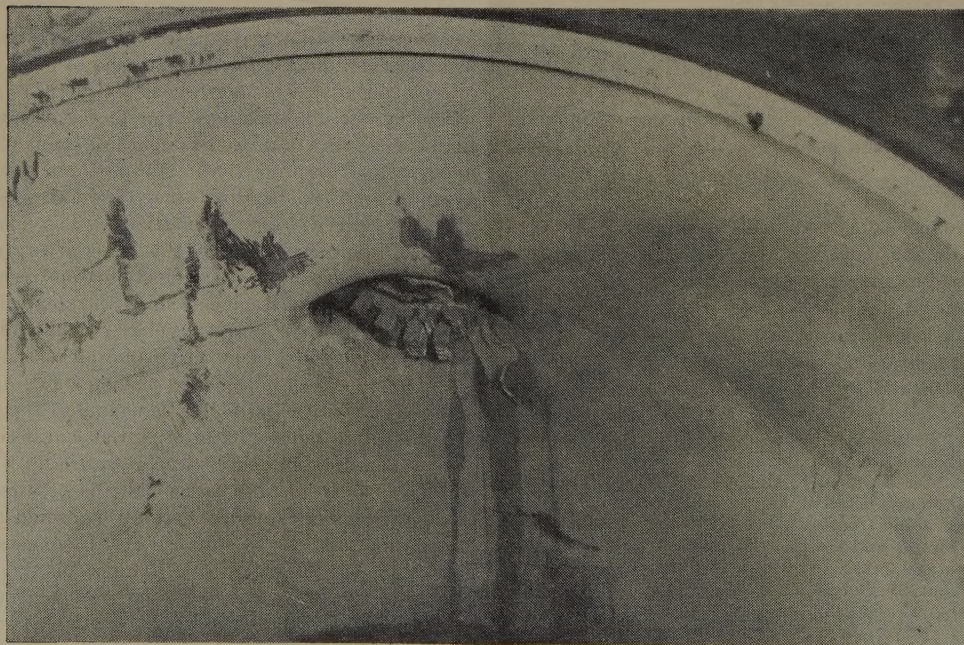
TYPICAL TEST PIT WALL DAMAGE
